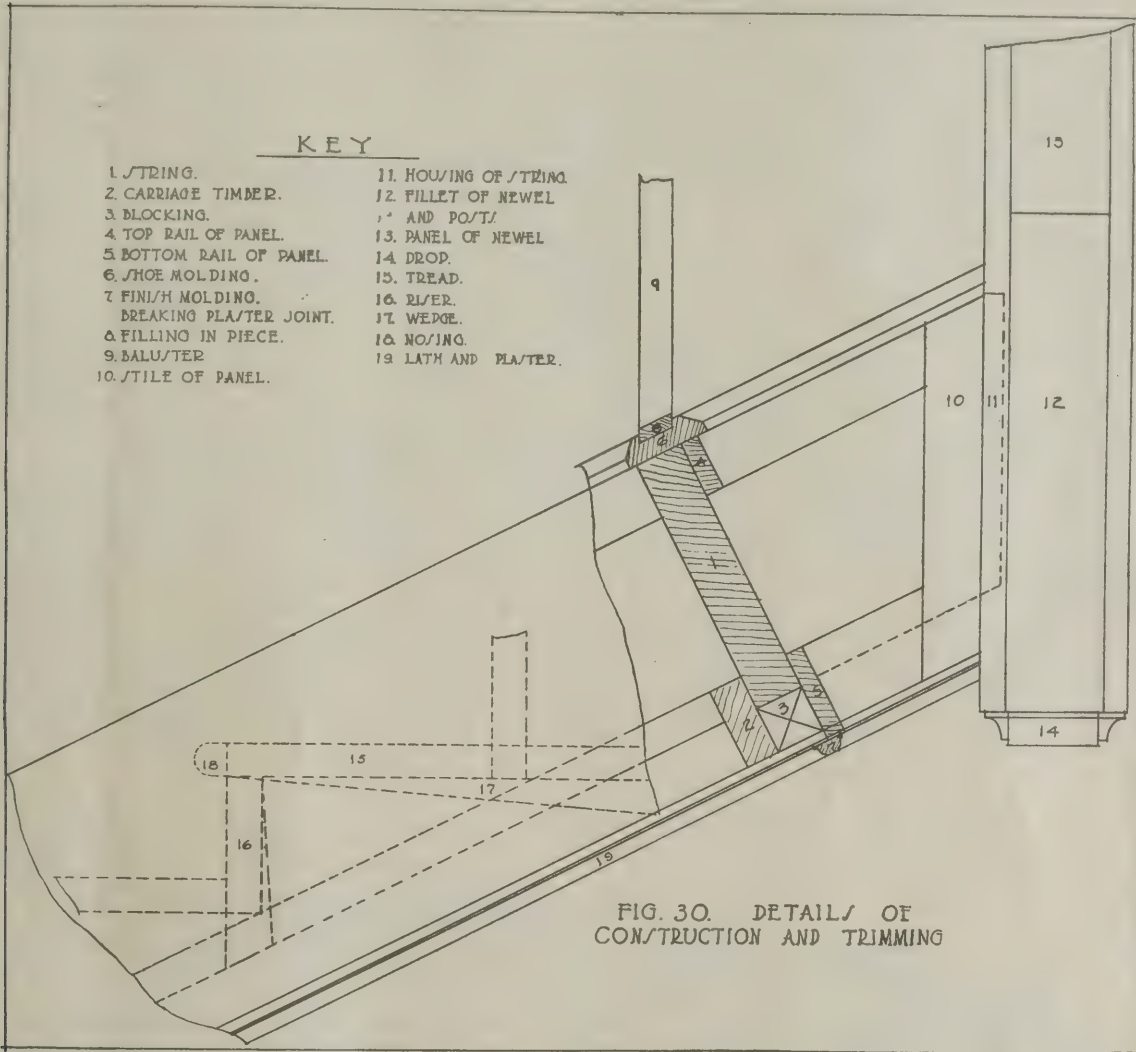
DETAILS OF CONSTRUCTION AND TRIMMING
